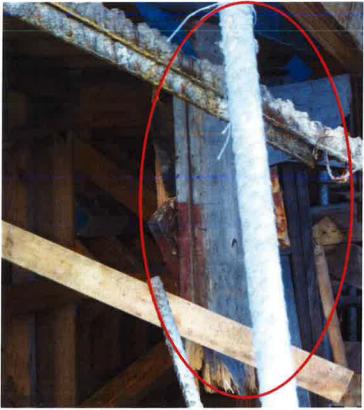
Shoring Tower C4, southern legs (behind rebar). Note weathered wood.
